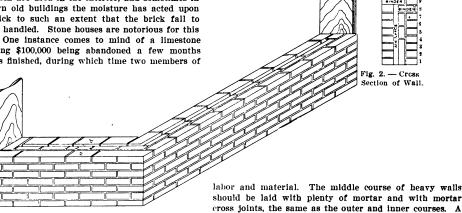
Form of Construction Often Used for Dwelling Houses.
